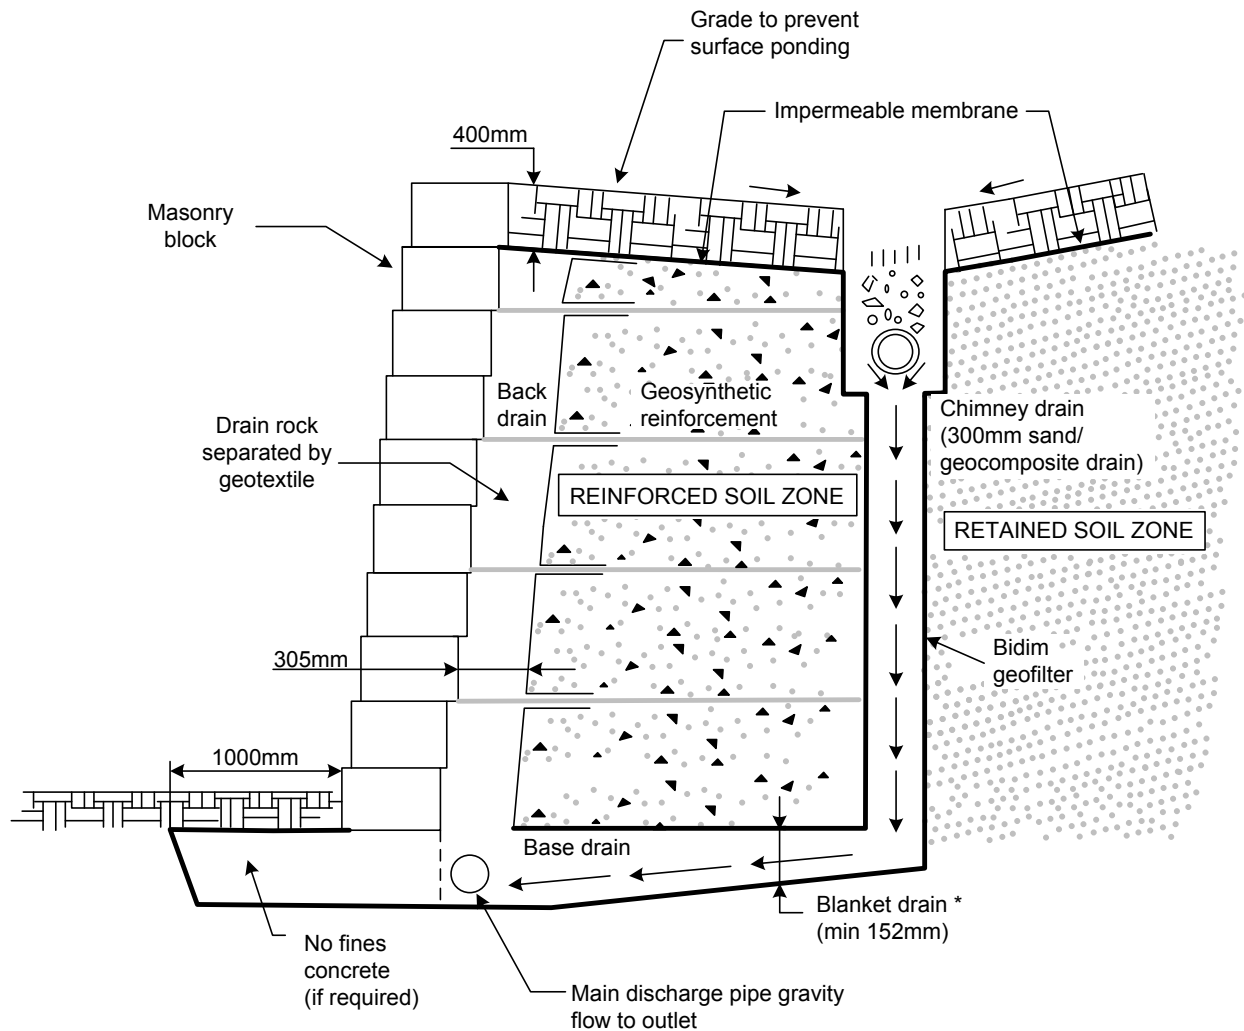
Recommended drainage system. Figure adapted from “A database and analysis of geosynthetic reinforced wall failures” (Koerner & Koerner, 2009) and “The importance of drainage control for geosynthetic reinforced MSE walls” (Koerner & Koerner, 2011)
